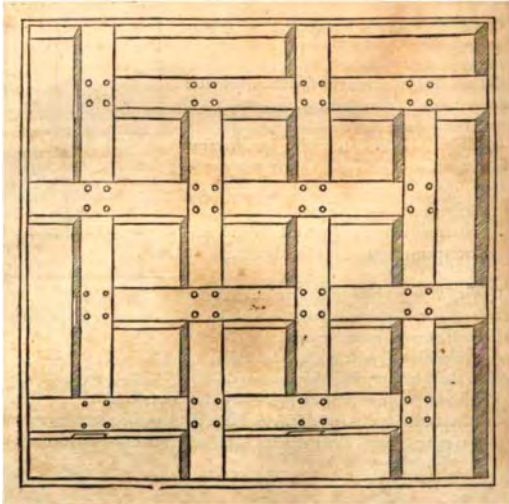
Drawing by Serlio (1545) of a floor with short beams.
